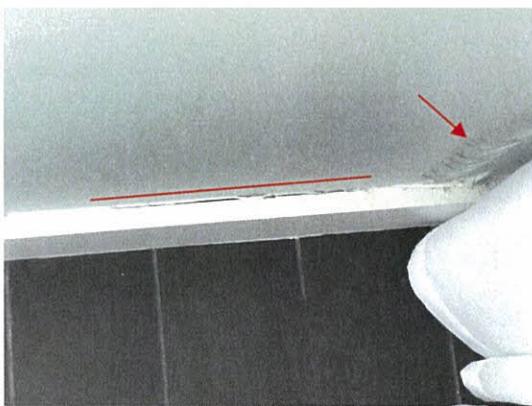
Signs of water intrusion and damage at wall below window and, baseboard which entered through the window sill due to the buffeting of windows which occurred during the Hurricane.
